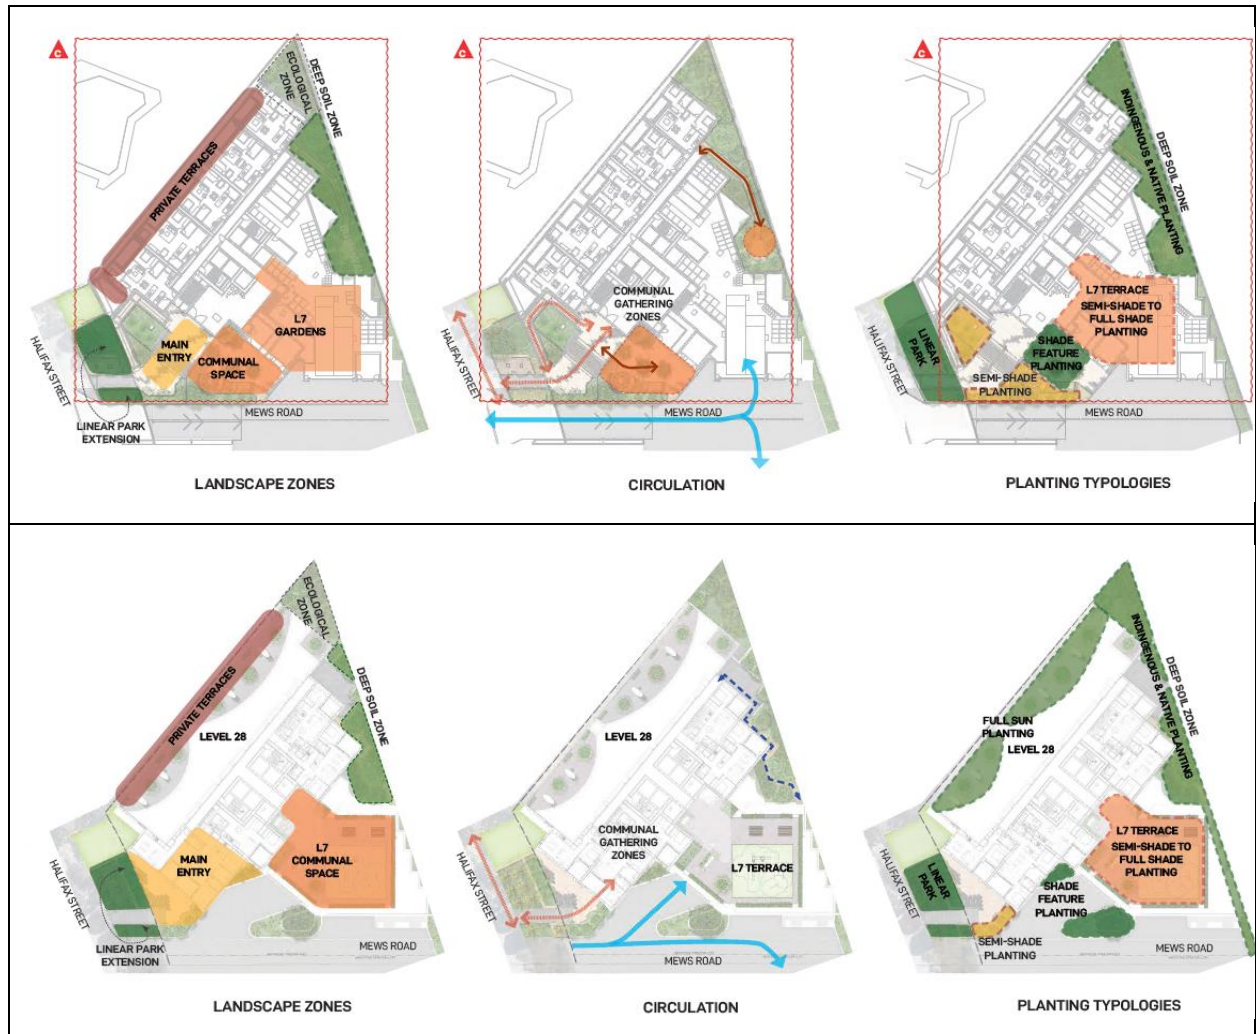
Approved landscape design and proposed landscape design with new entry to Building A
